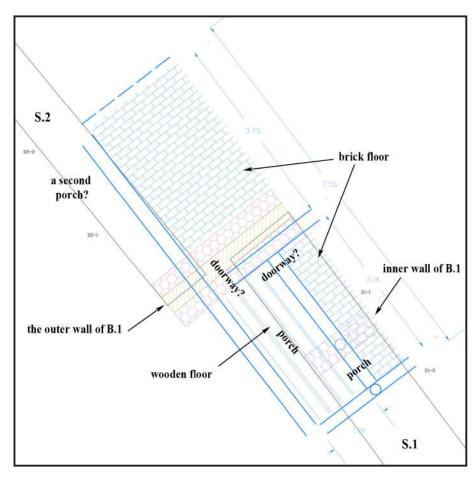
Plan of the Building 7 (overlaying B.1) and a possible reconstruction.
